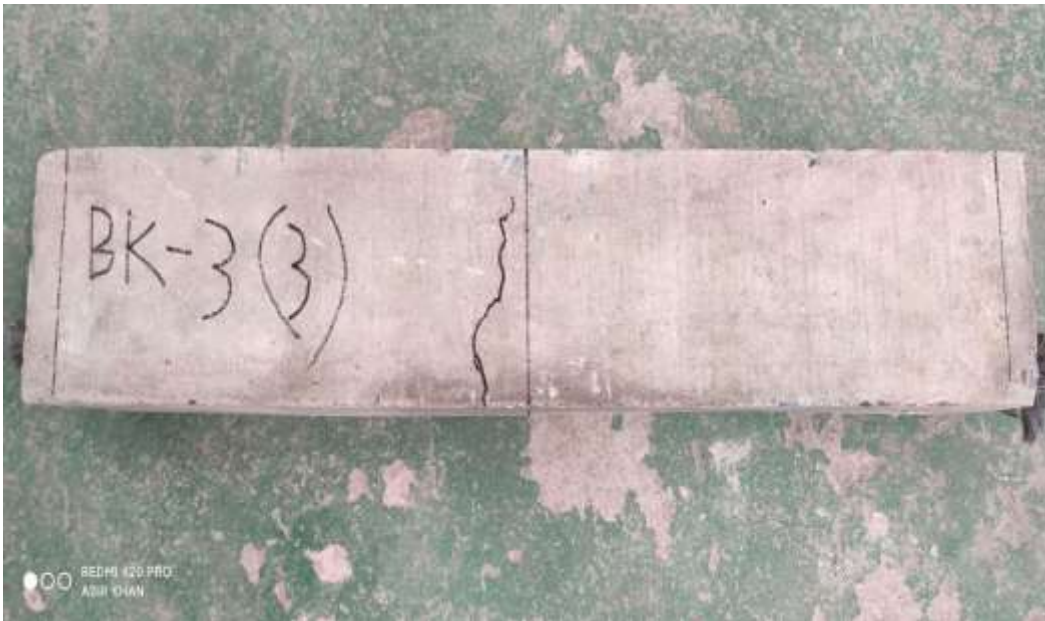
Failure Pattern (for Type 3-1 Beam)
